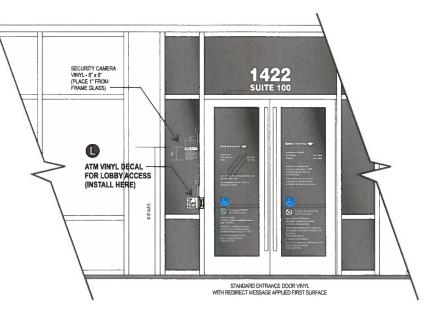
PHOTO SURVEY OF PROPOSED Scale: Not to Scale
